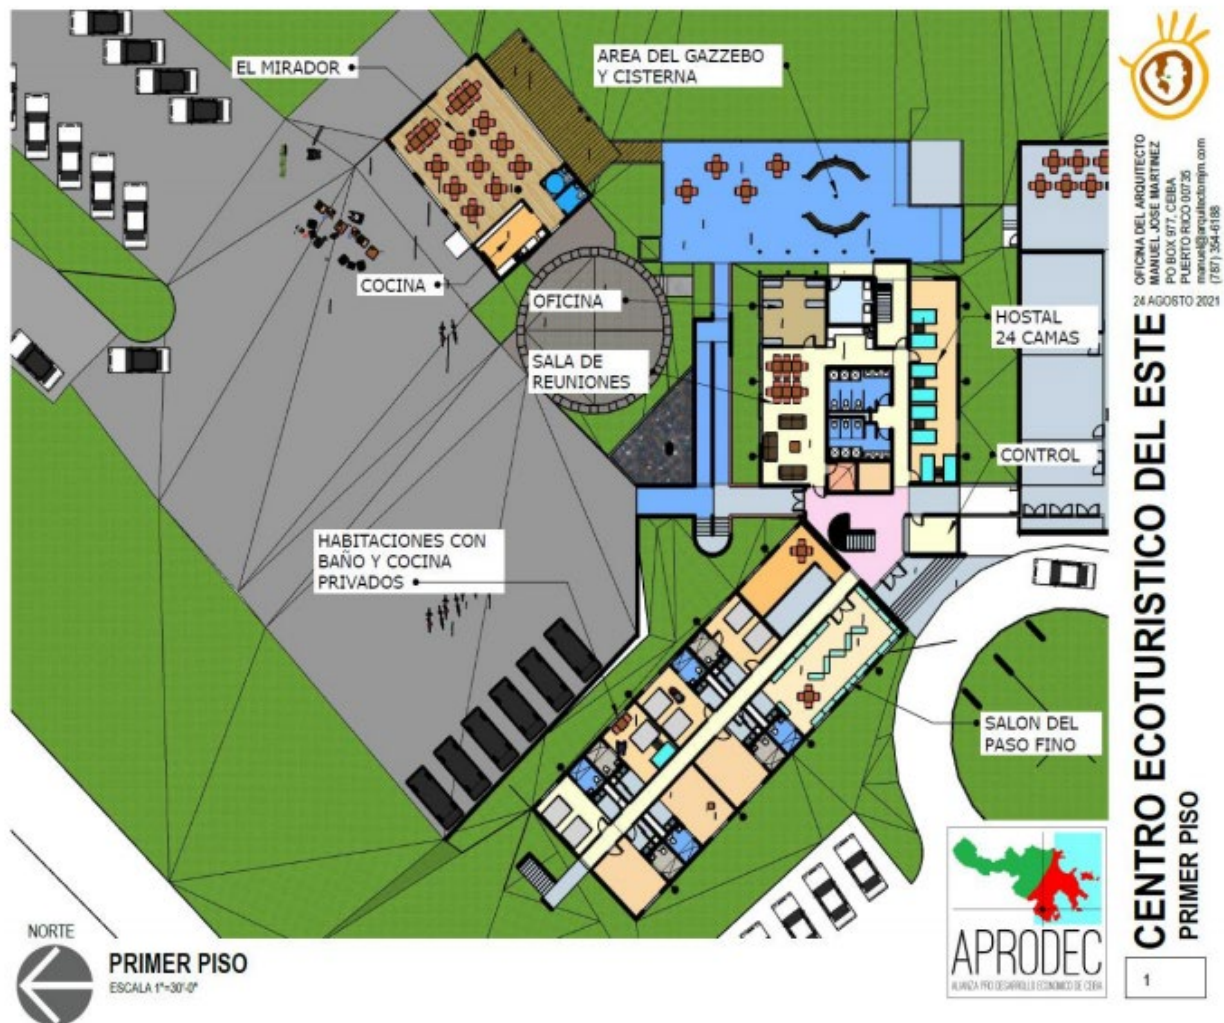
## EXHIBIT D: DRAWING SHOWING PROPOSED BUILDING'S USE - EQUINOTERAPIA PR
